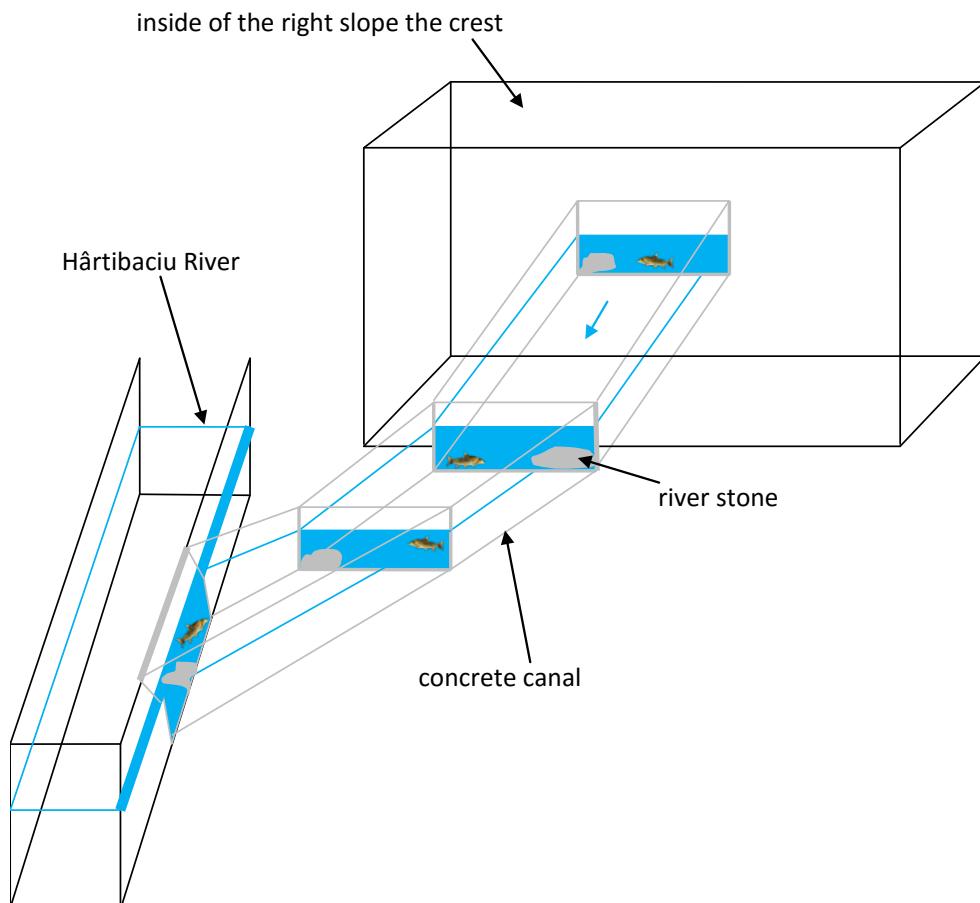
Fixing river stones inside the concrete canal – indicative scheme.
